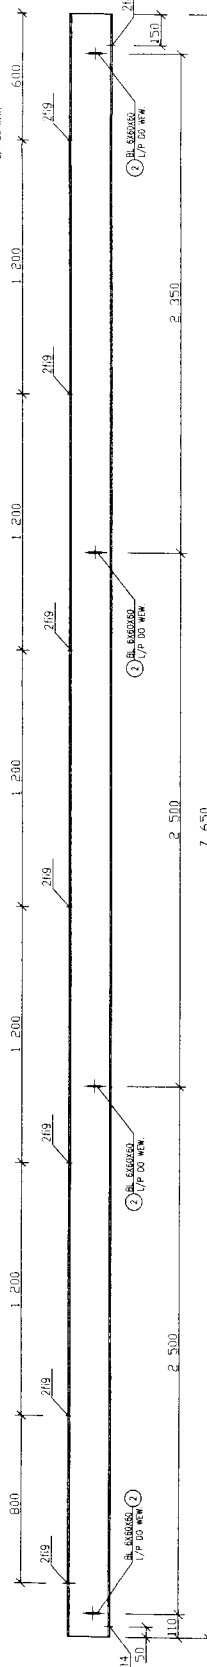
illustrates the reinforcement layout of the bridge deck. The deck width is 26.00m. The reinforcement layout is detailed with dimensions and bar specifications. The diagram shows a longitudinal section of the bridge deck with reinforcement bars (20/9 and 20/14) and stirrups (B. 8/20/200 L/P 00 NEW). The deck width is 26.00m. The reinforcement layout is detailed with dimensions and bar specifications.
